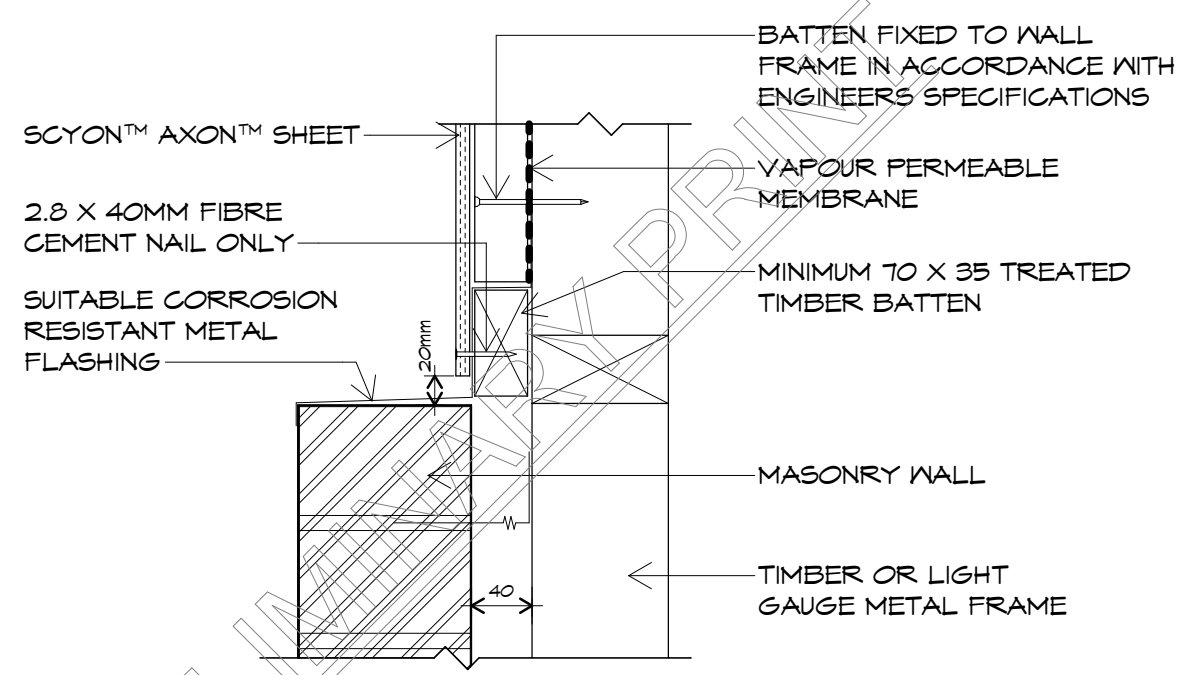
HORIZONTAL JOINT ON BATTENS
